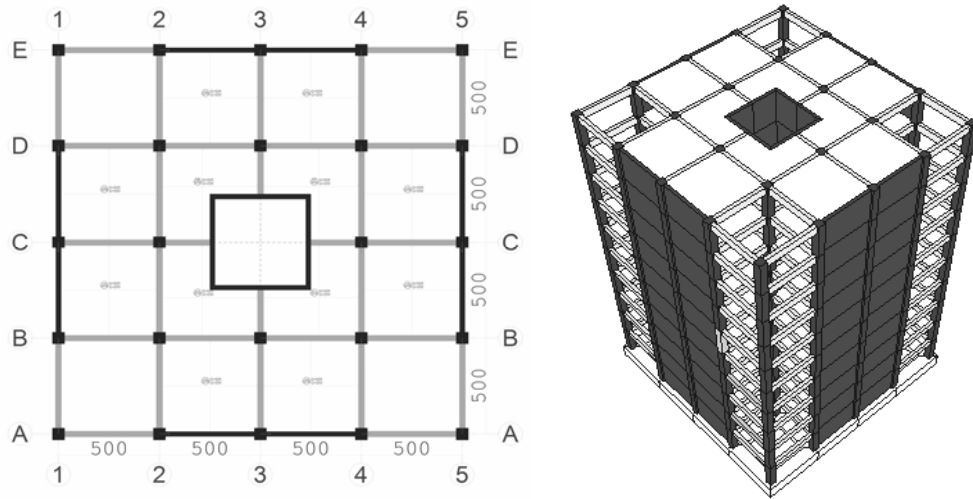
Structural plan and 3D view of parametric model IIIc
